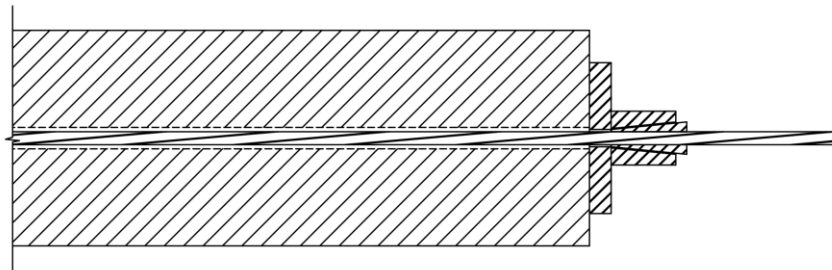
Unprotected post-tensioning anchorage longitudinal section drawing.
